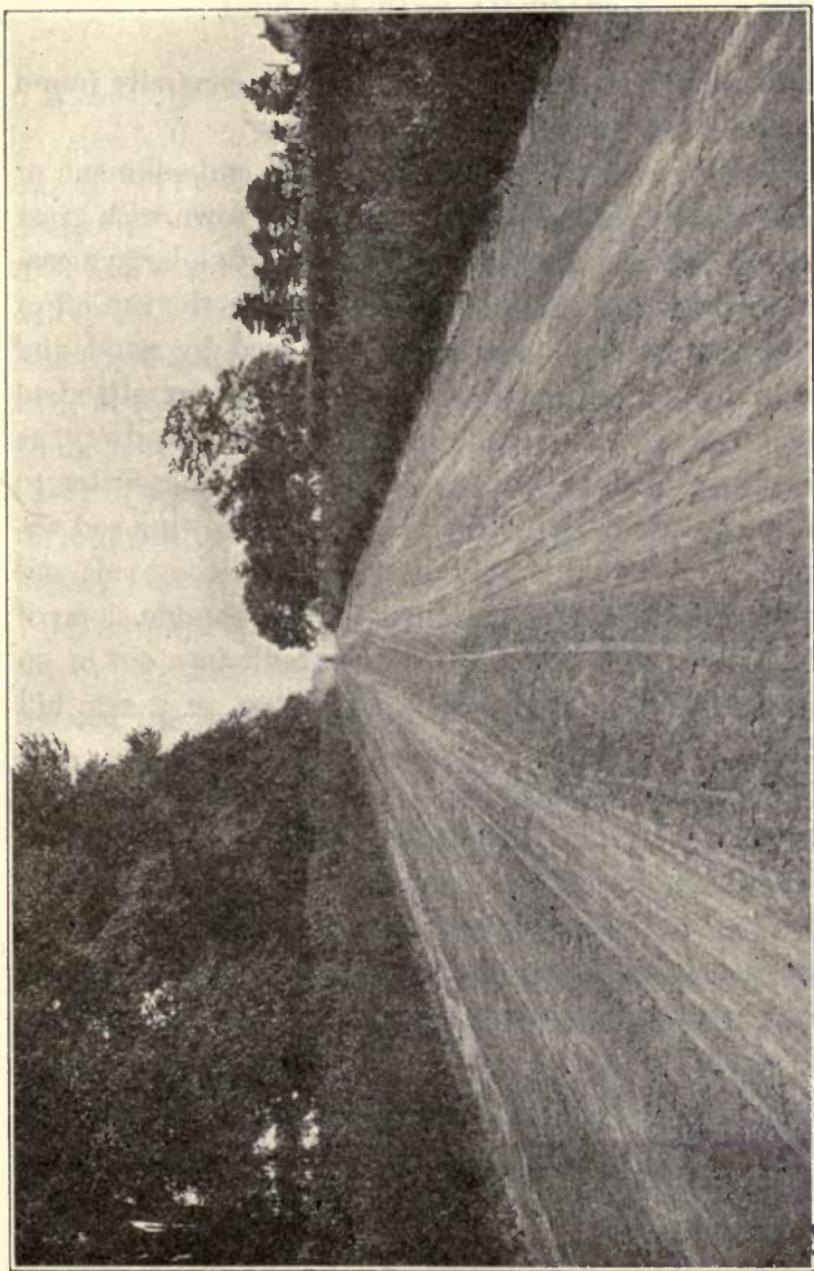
Well shaped, graded, and drained earth road improved at a cost of \$55 per mile.
